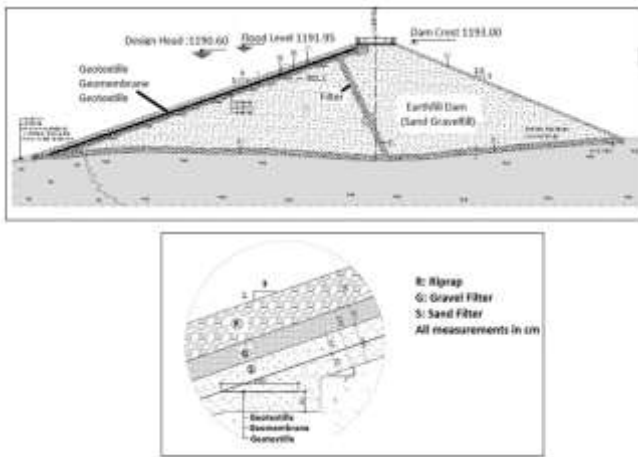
Maximum Cross section and a cross section on the abutment of Kızık Dam in the first alternative of the designs (State hydraulic Works, 2013)
